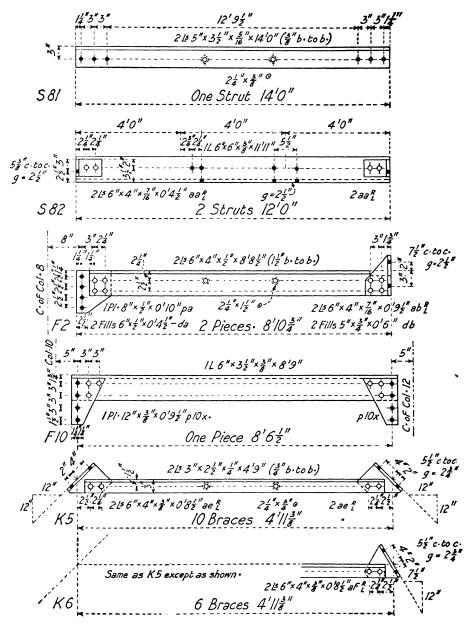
STANDARD DETAILS FOR ANGLE STRUTS.
